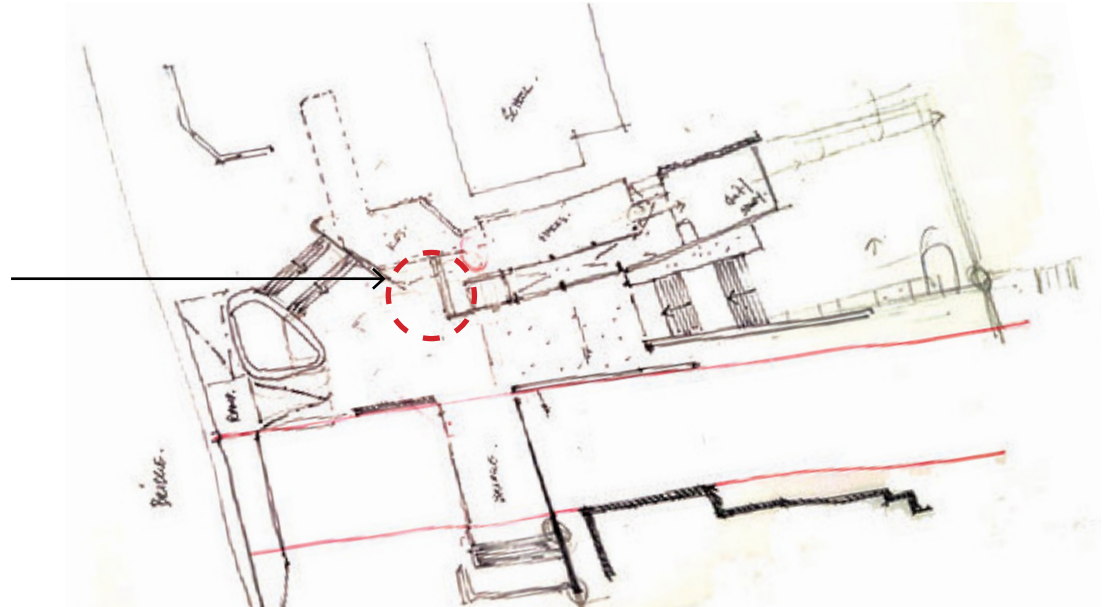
Design 2 - Level 1 floor plan development 1
